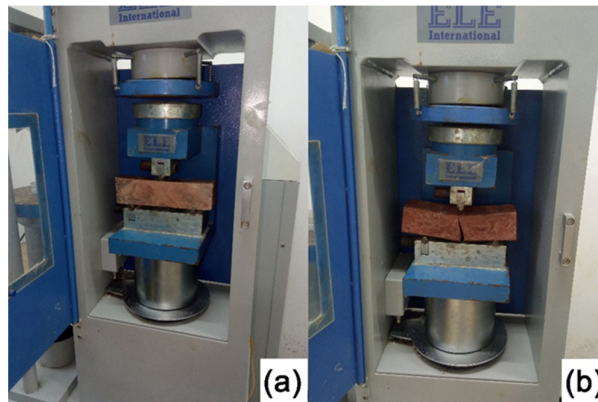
Three-point bending test (a) before the test, (b) after the test
